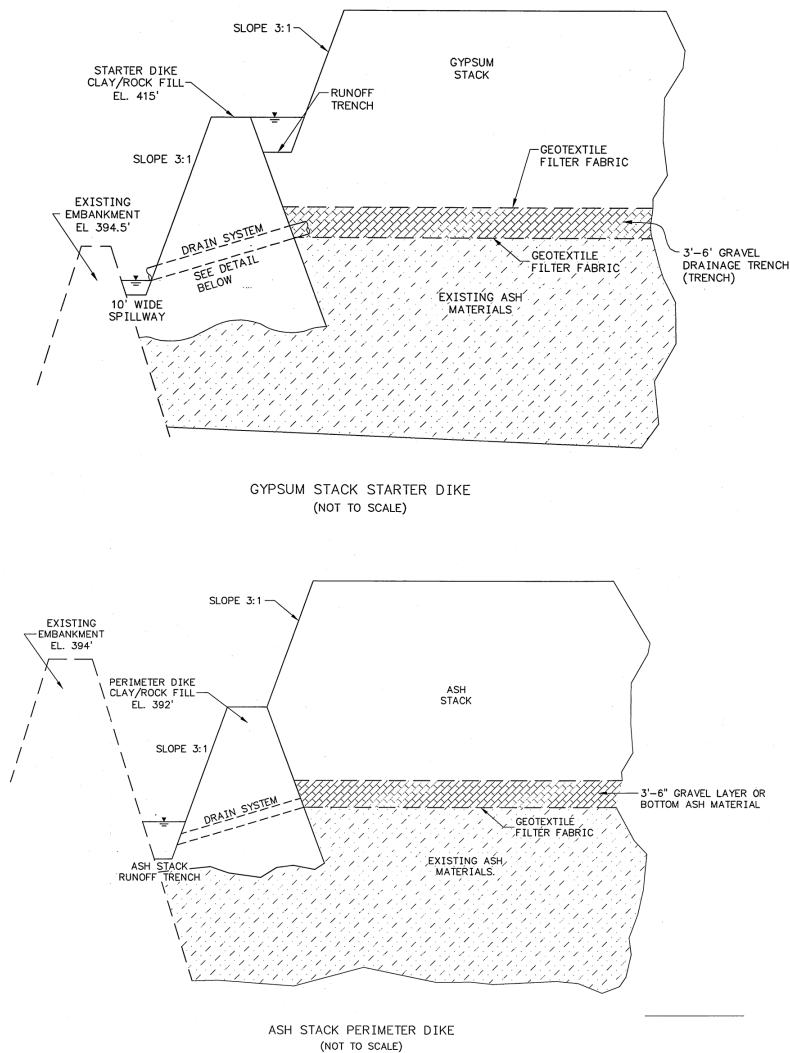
Design Details for Underdrain System of Gypsum Storage Area (top) and Dry Ash Stack (bottom) as depicted on TVA Drawing No. 10W302-25 (2003)
